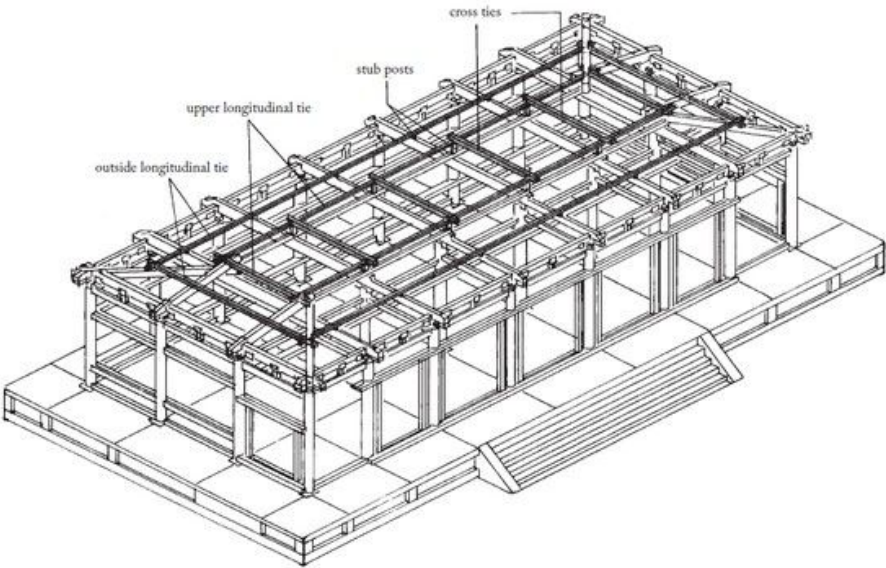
The Picture Hall after installation of the stub posts, outside and upper longitudinal ties, and cross ties.
